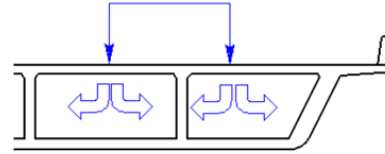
Truck Load Path from Deck Slab to Girders
